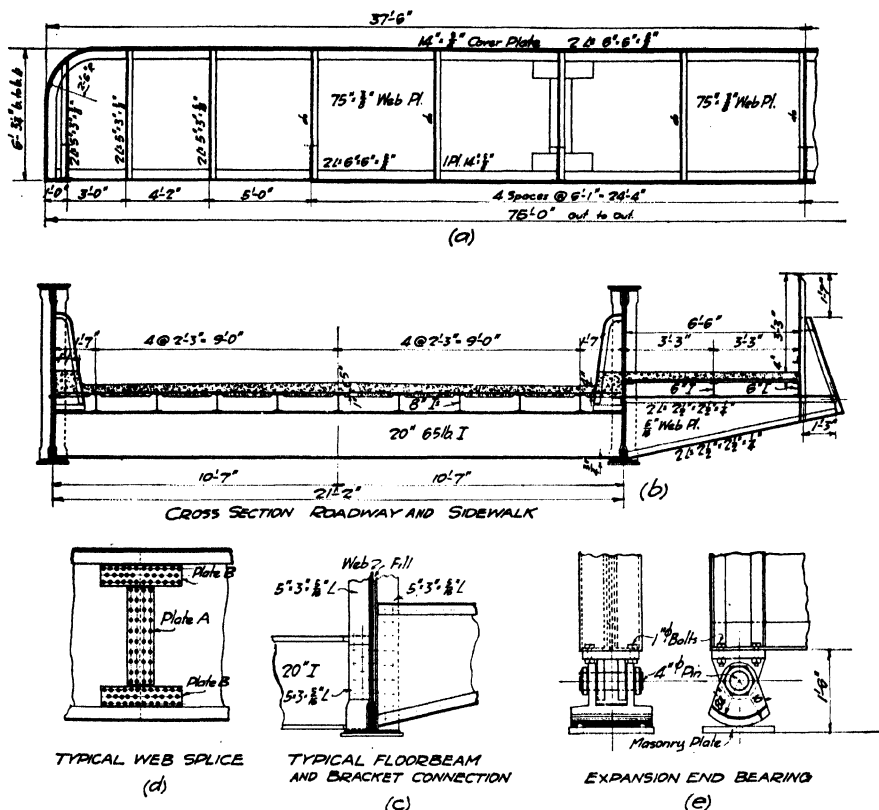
General drawing, 75-ft. plate girder highway bridge.
